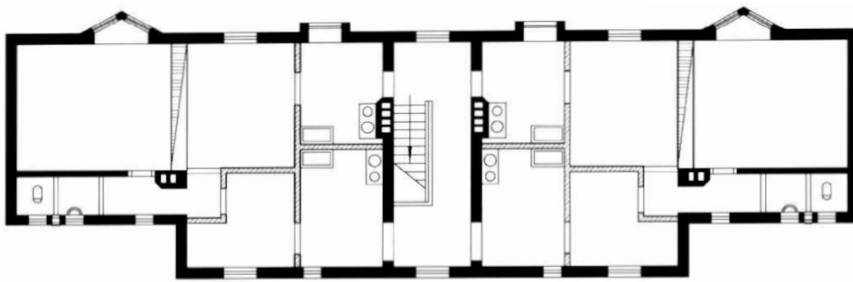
Apartment housing for Manchurian Railway, standard unit floor plan
